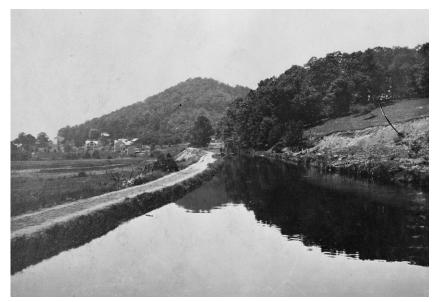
Canal prism looking west toward Hackettstown Credit: Library of Congress, Prints & Photographs Division, HAER NJ,21-PHIL,1--32
